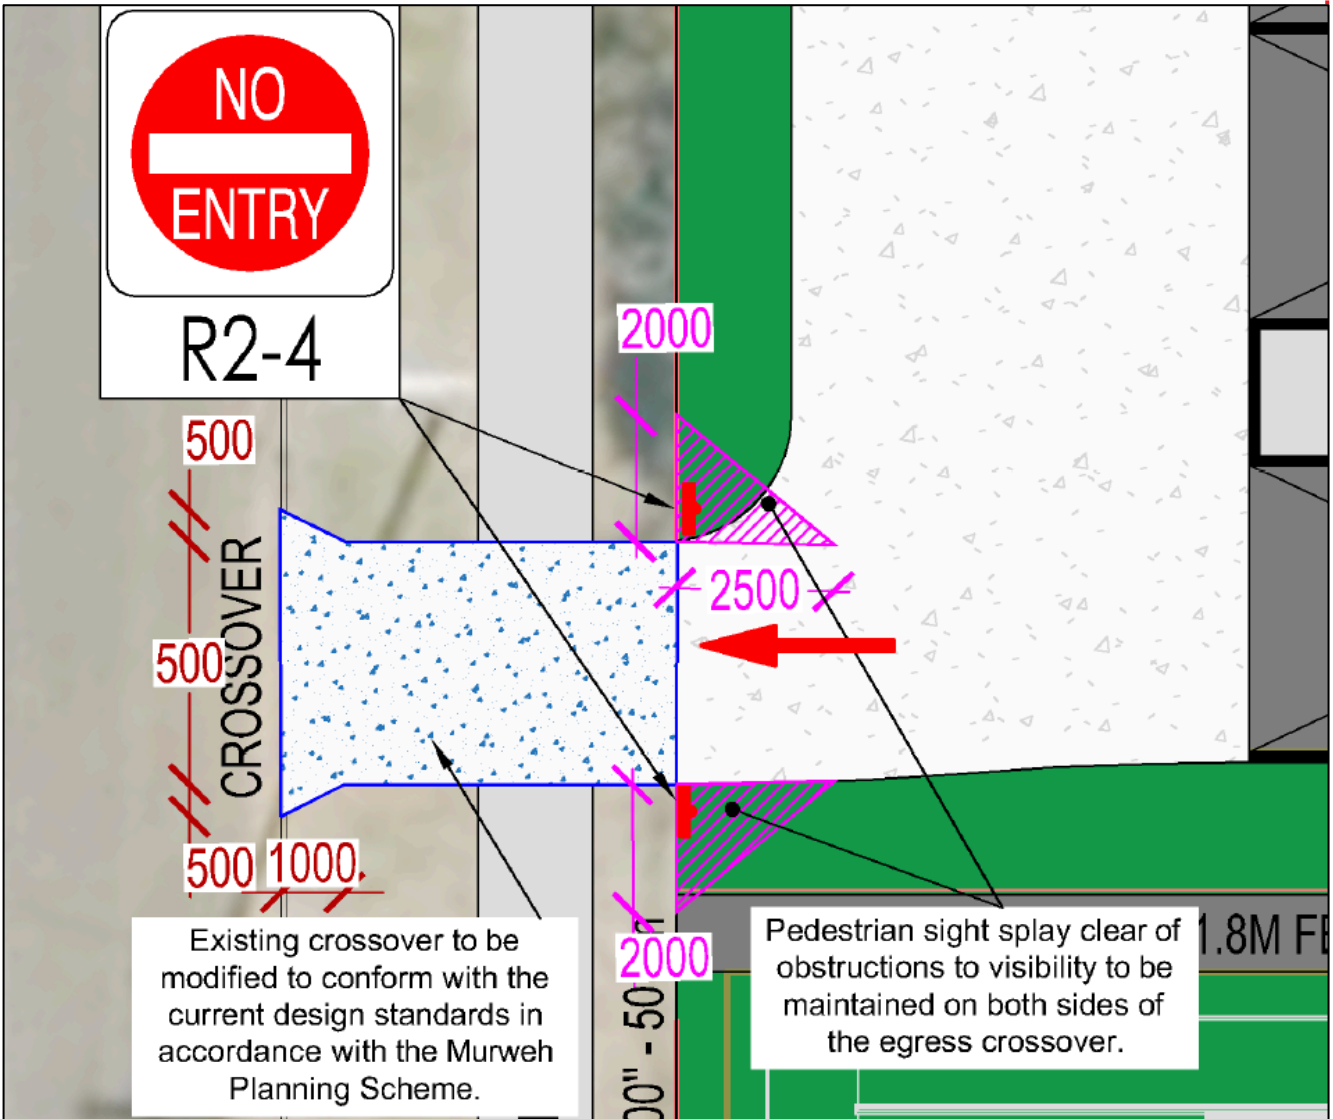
DETAIL B - Detailed Sturt Street exit crossover design
